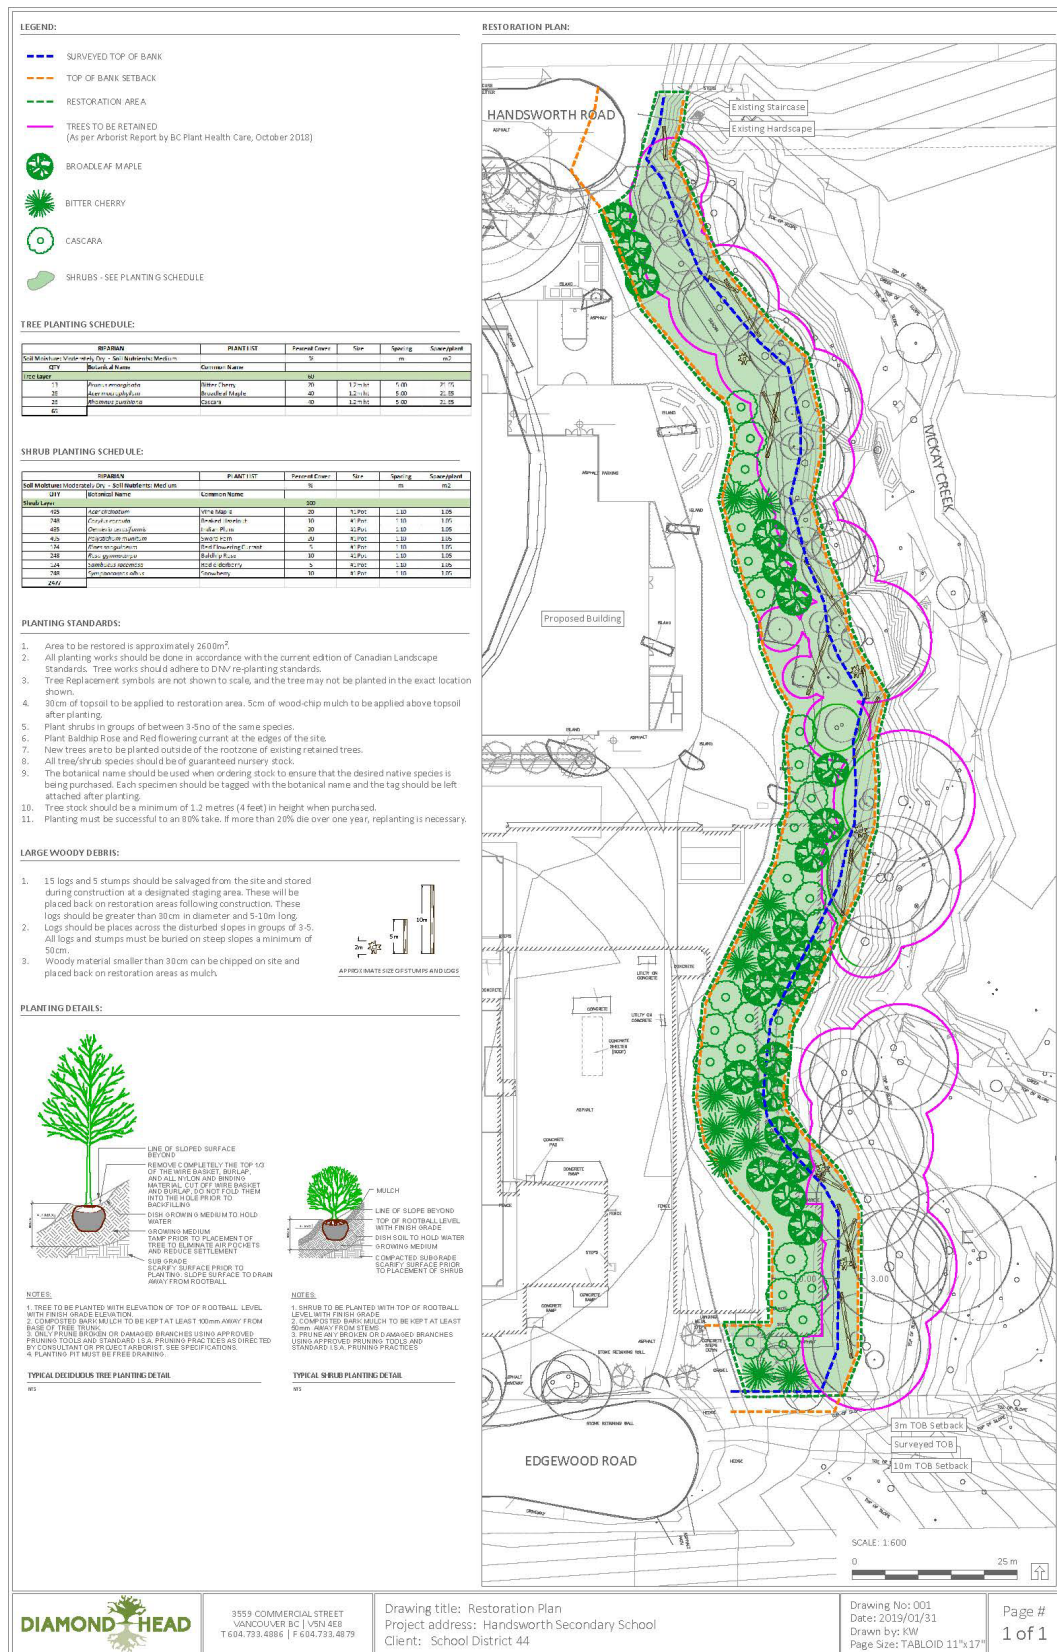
Restoration plan for the 10 m setback from top of bank for Handsworth Secondary School.
